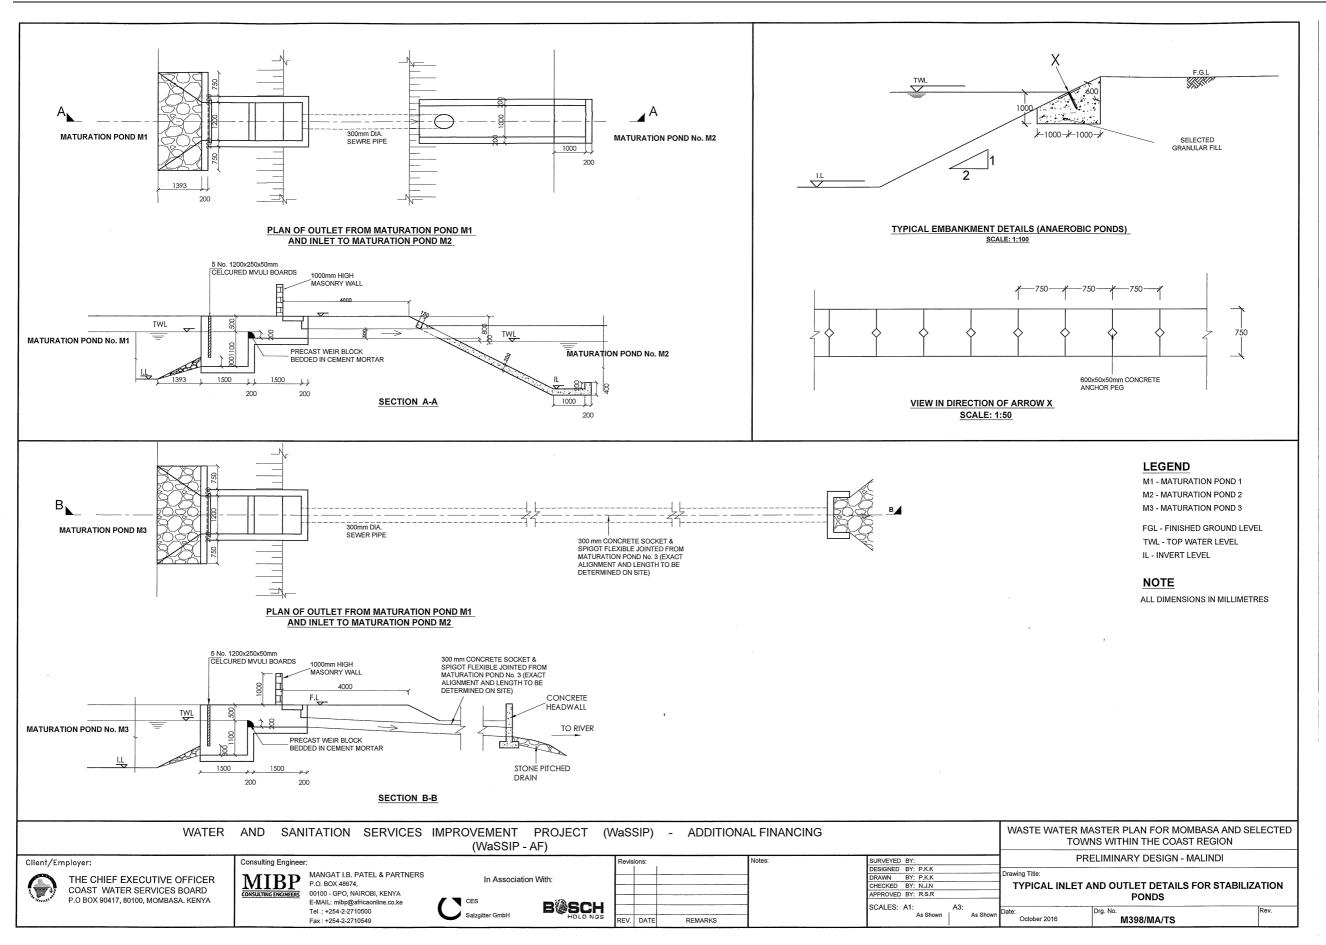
Typical Inlet and Outlet Structures for the Ponds
